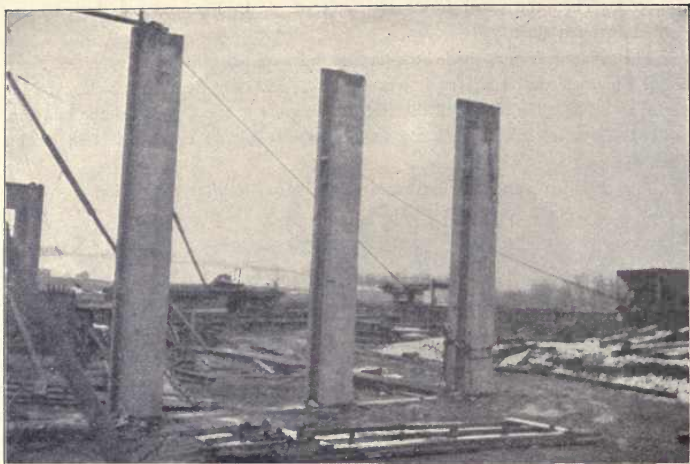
Wall Piers for an Atlas Portland Cement Company Building. (See p. 173.)
